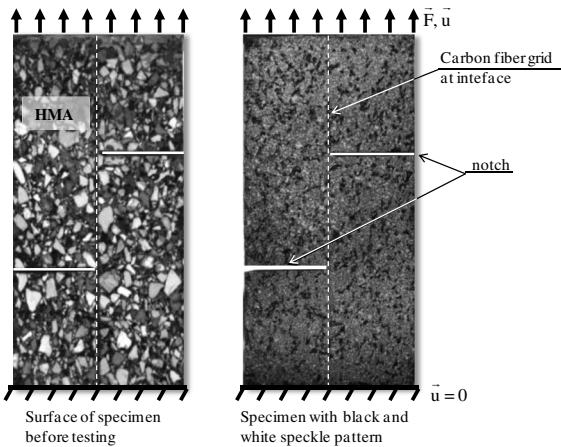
Double notch shear test (specimen geometry with loading configuration)
